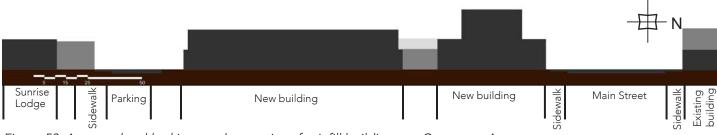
At street level looking south at options for infill buildings on Crosstown Avenue
